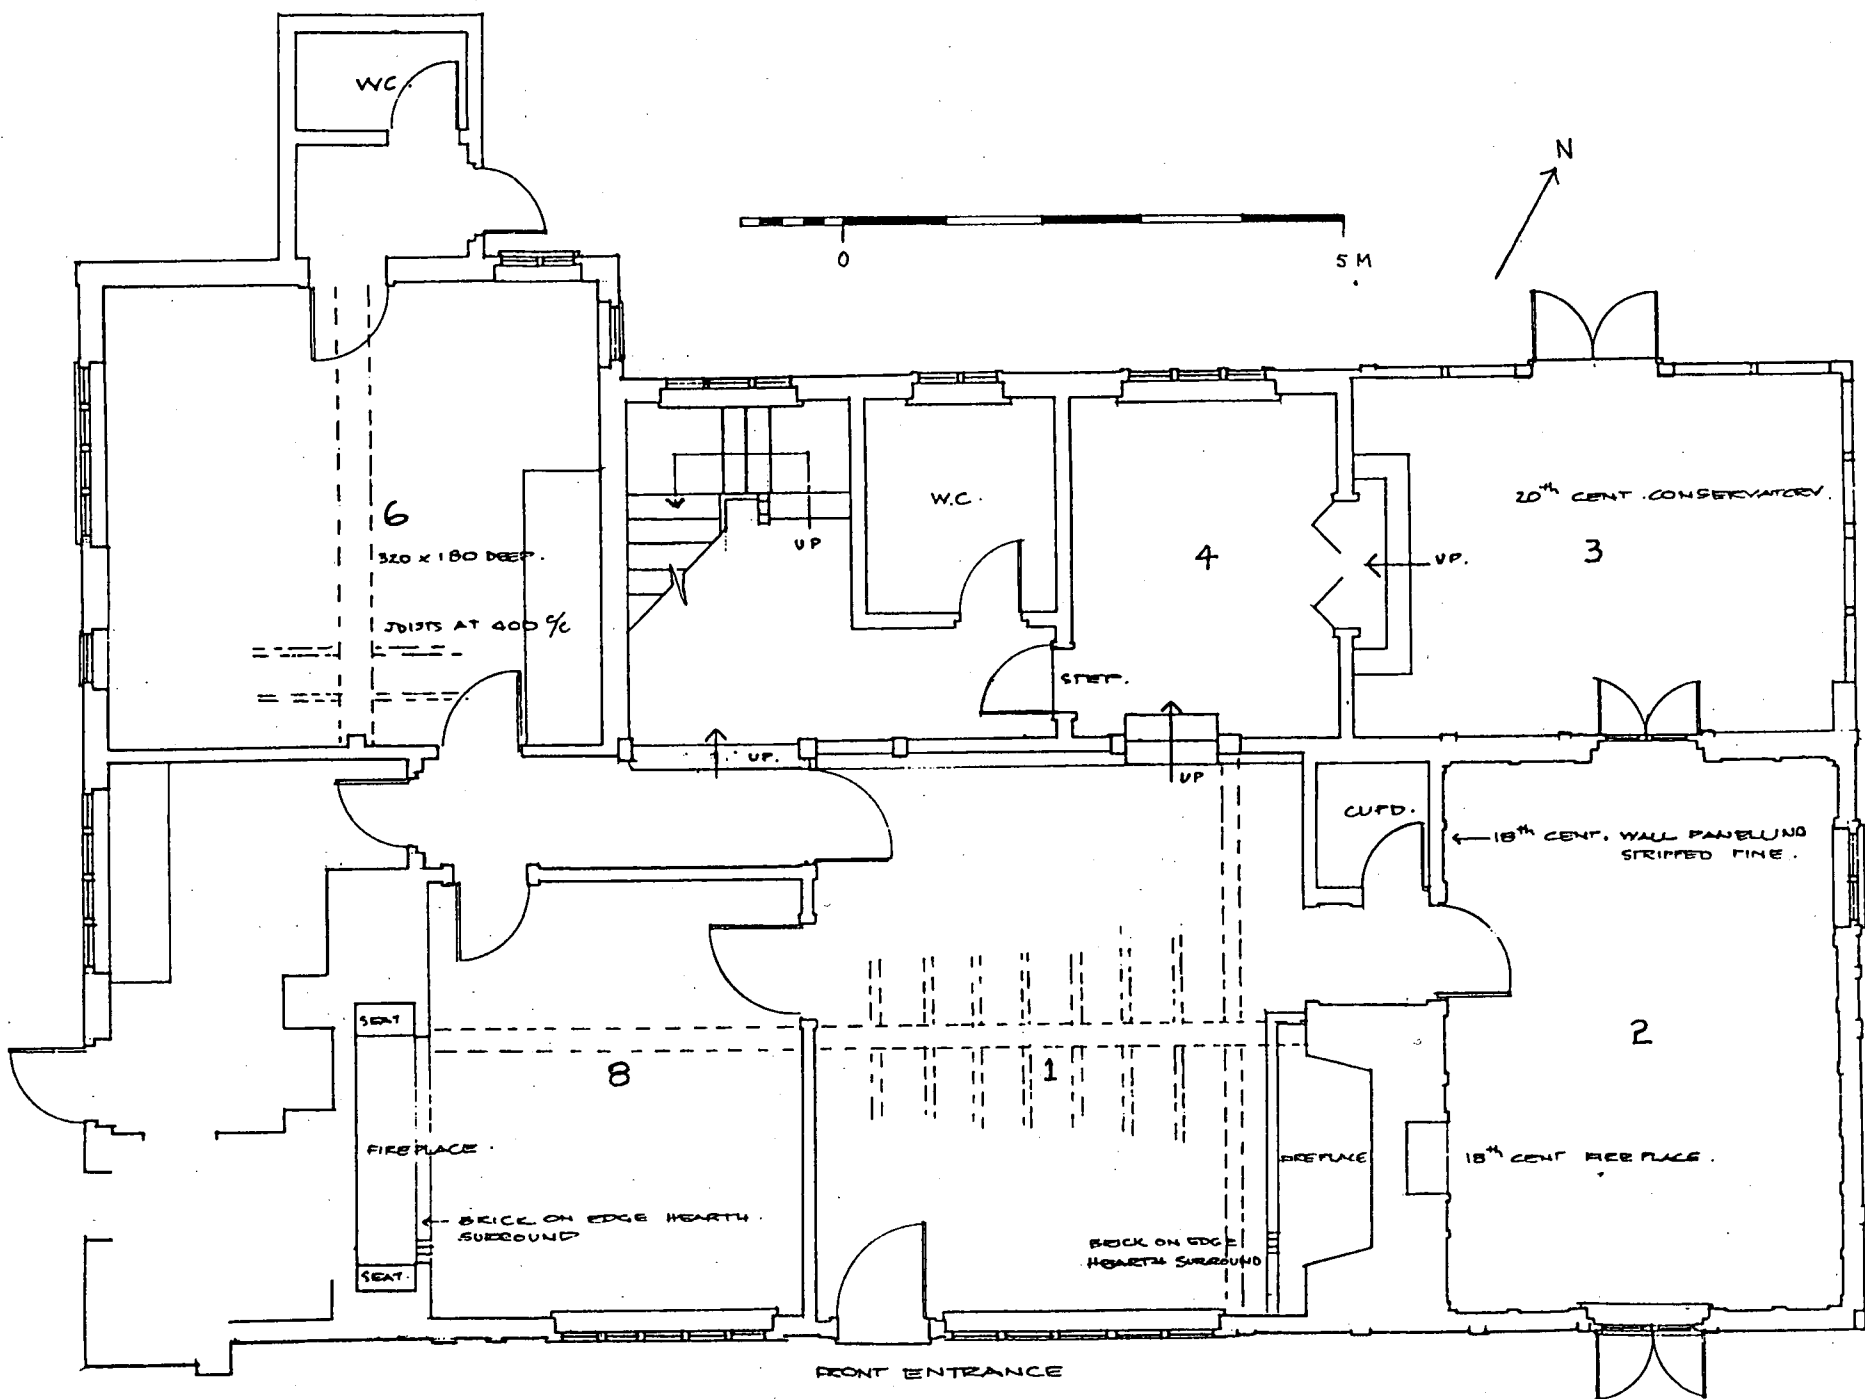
The Manor, Long Wittenham. Ground floor plan.
